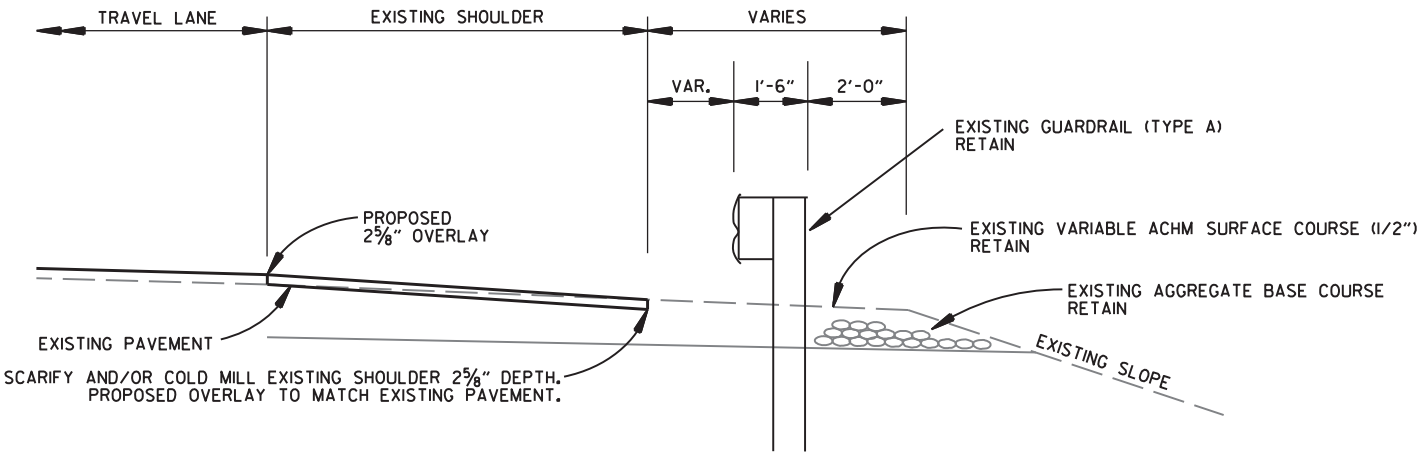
DETAIL FOR PAVEMENT TRANSITION AT END SPRINGHILL ROAD
